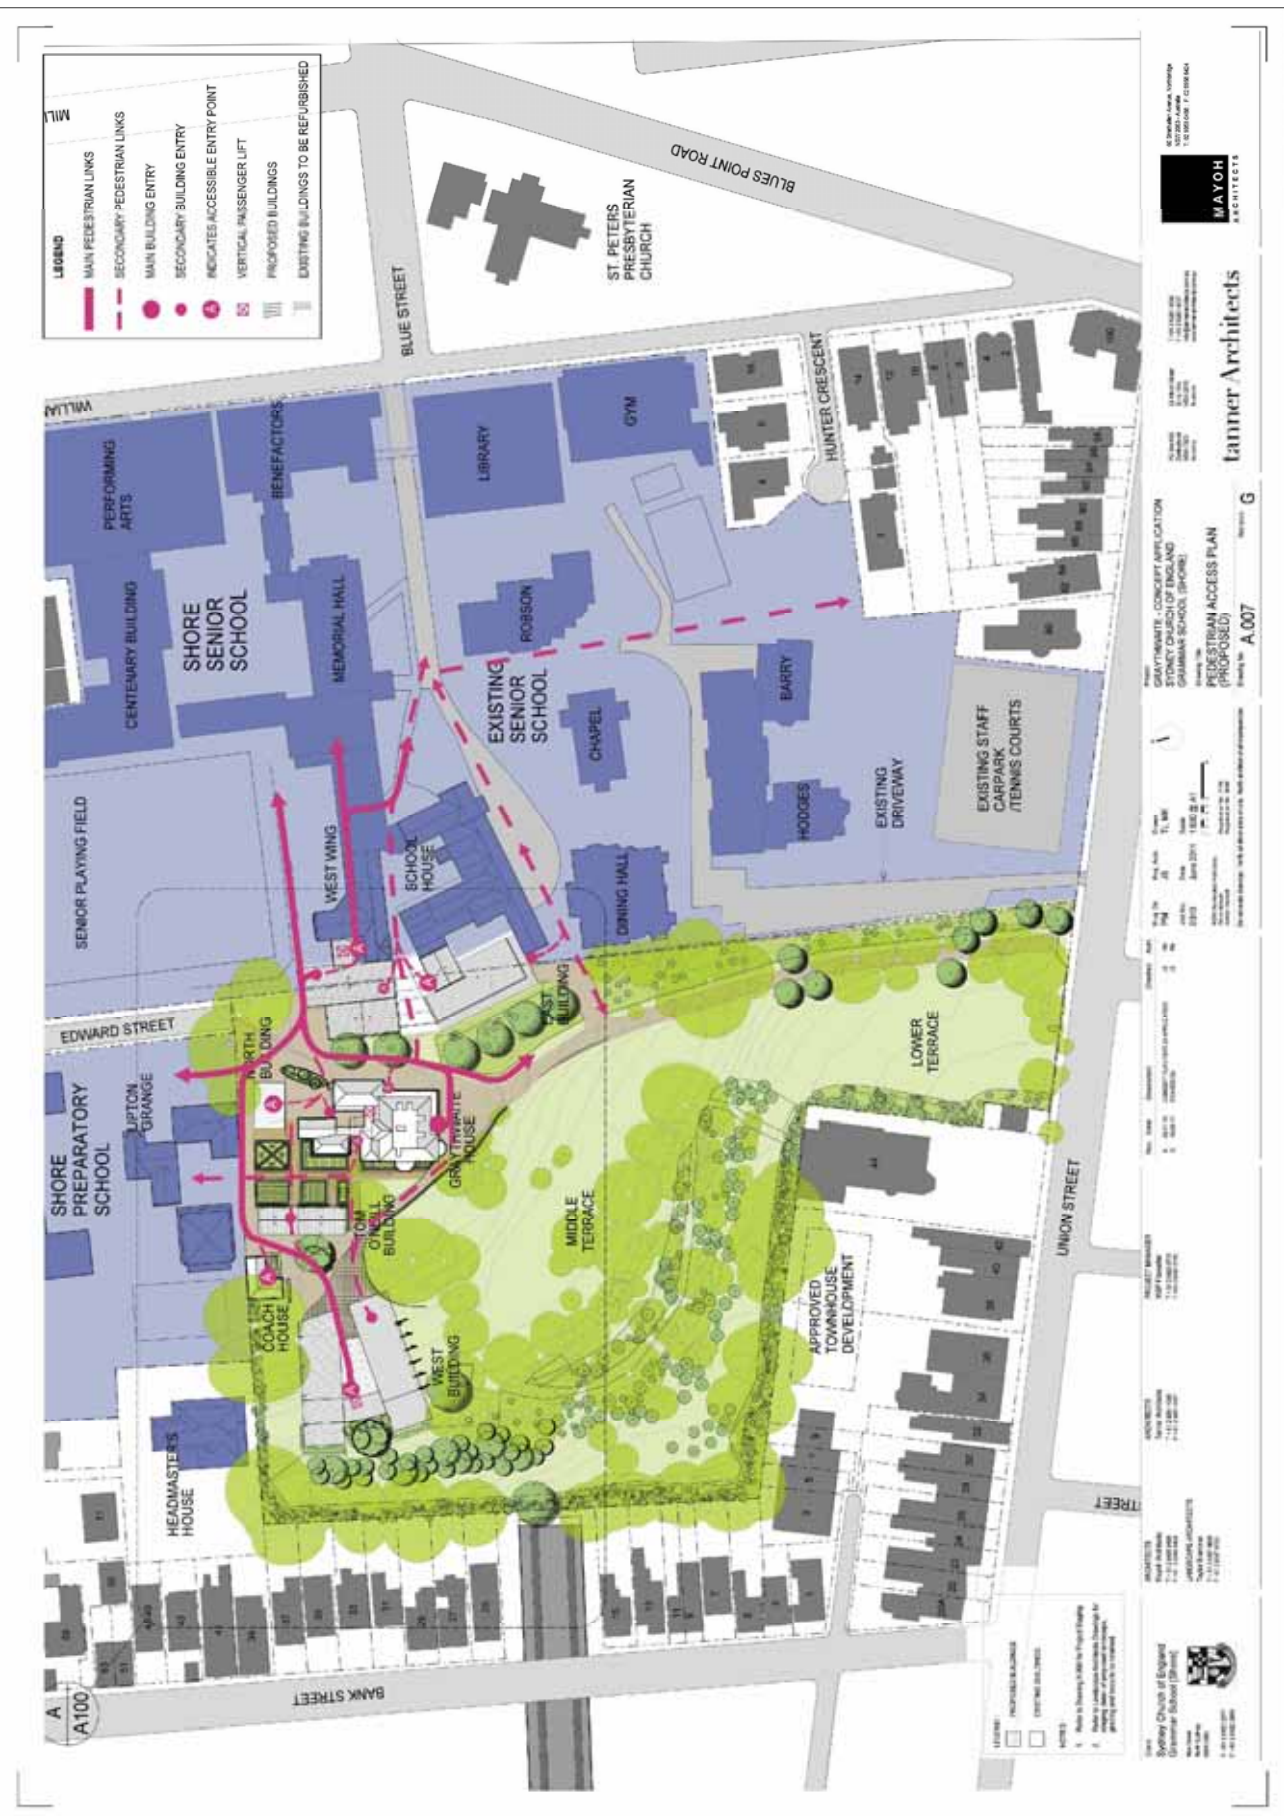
Pedestrian entry plan (Source: Mayoh Architects)
